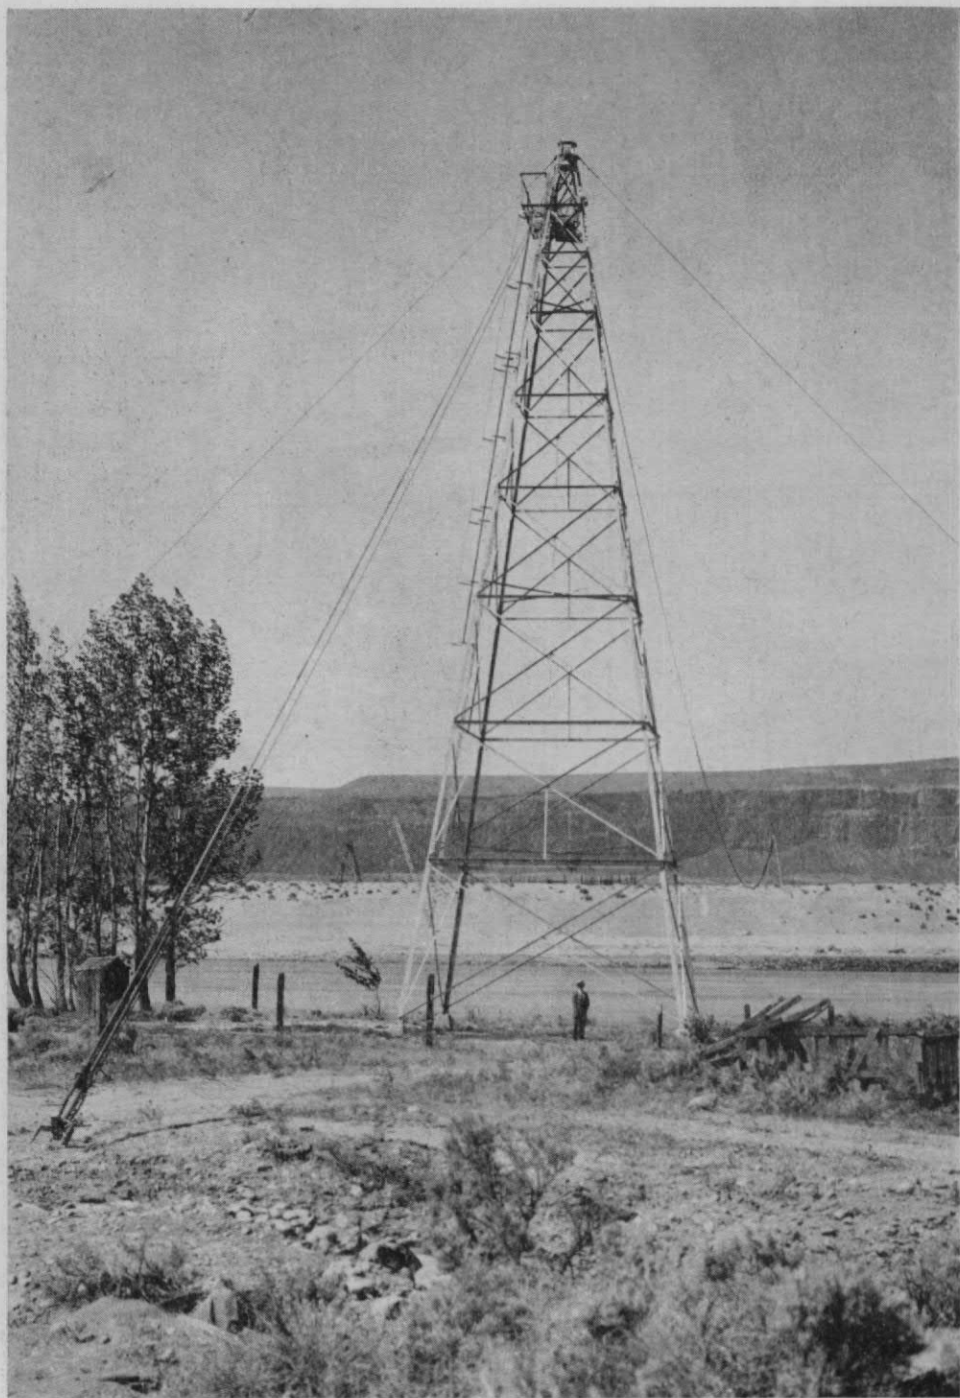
Cableway on Columbia River at Trinidad, viewed from left bank. Cable support tower is 84 feet high. Span is 1,654 feet.
